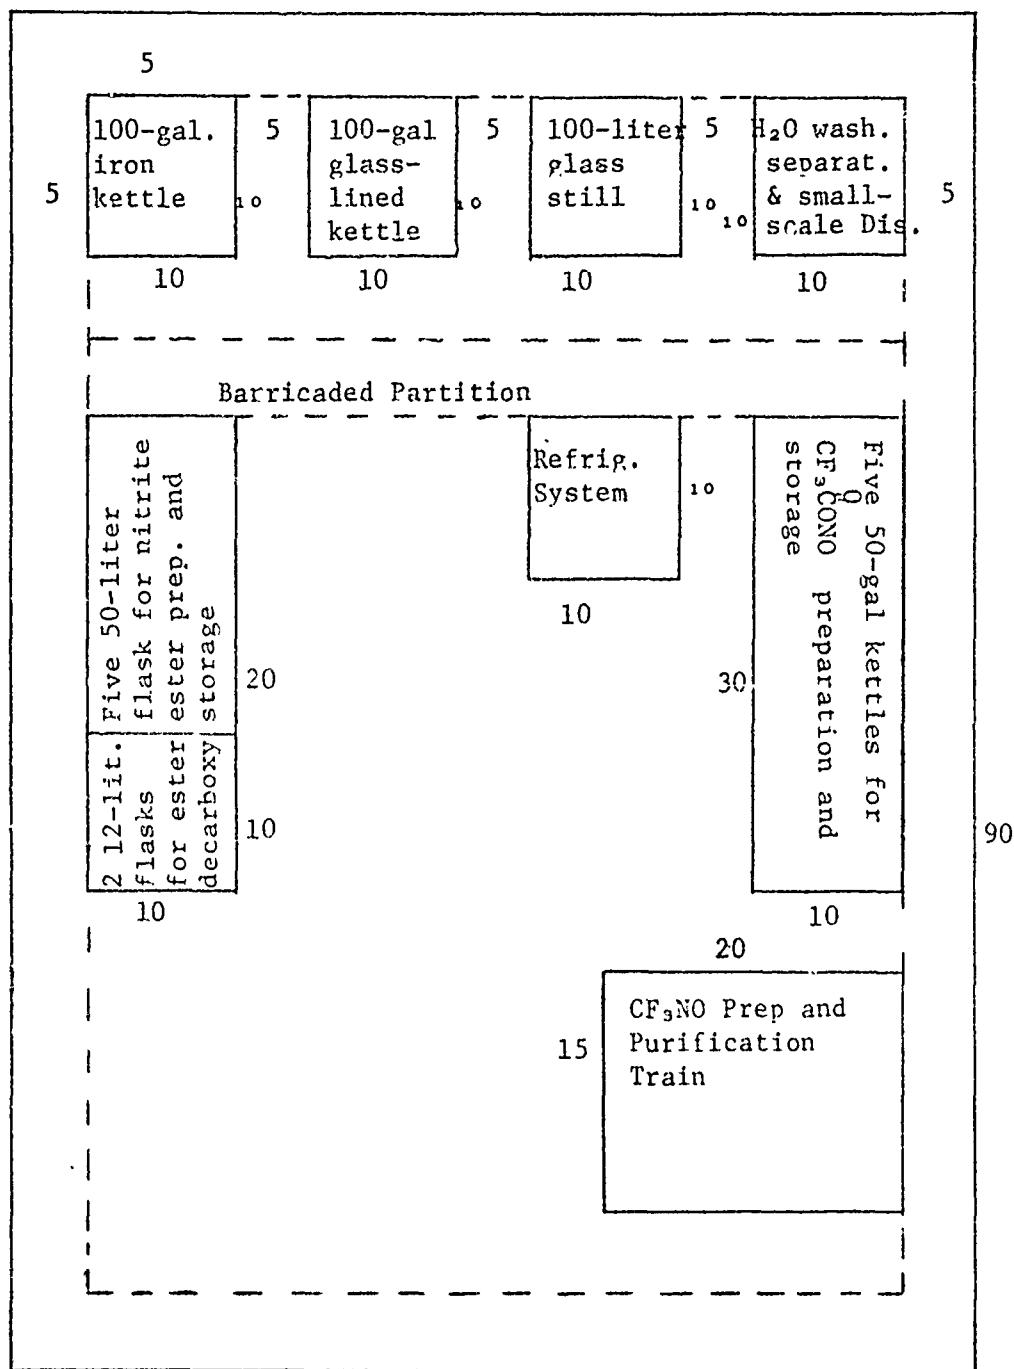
INTERMEDIATE SYNTHESIS BUILDING FLOOR PLAN
